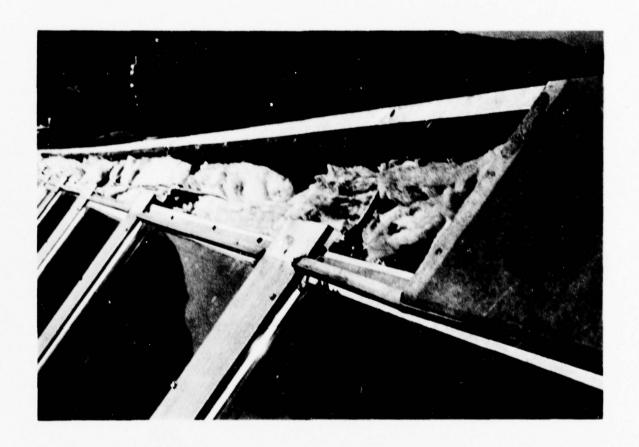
Roof Array Bleed Air Line (Looking East)
